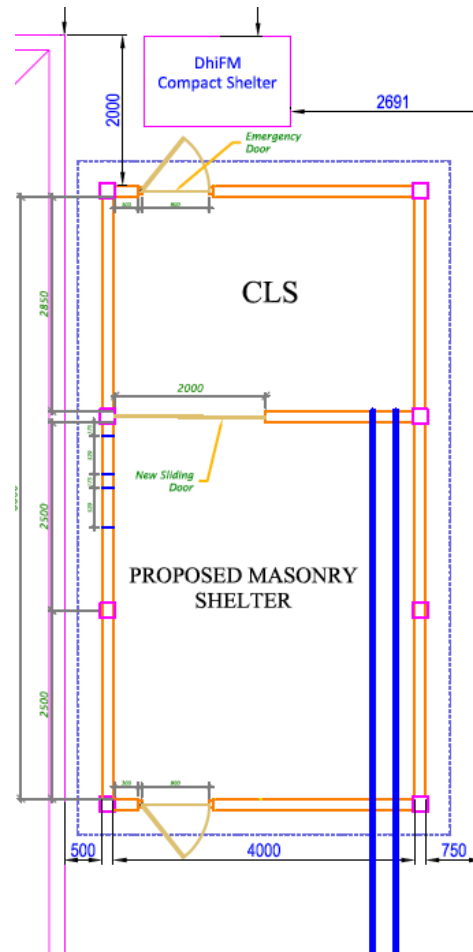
Site plan of masonry shelter in Kulhudhuffushi, Haa Dhaalu
